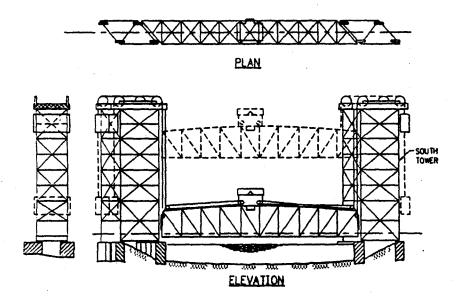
Vertical Lift Span with Power and Drive System on Lift Span; Due to Skew of Channel, Double Trunnions are Used To Place Counterweight on Back Towers
